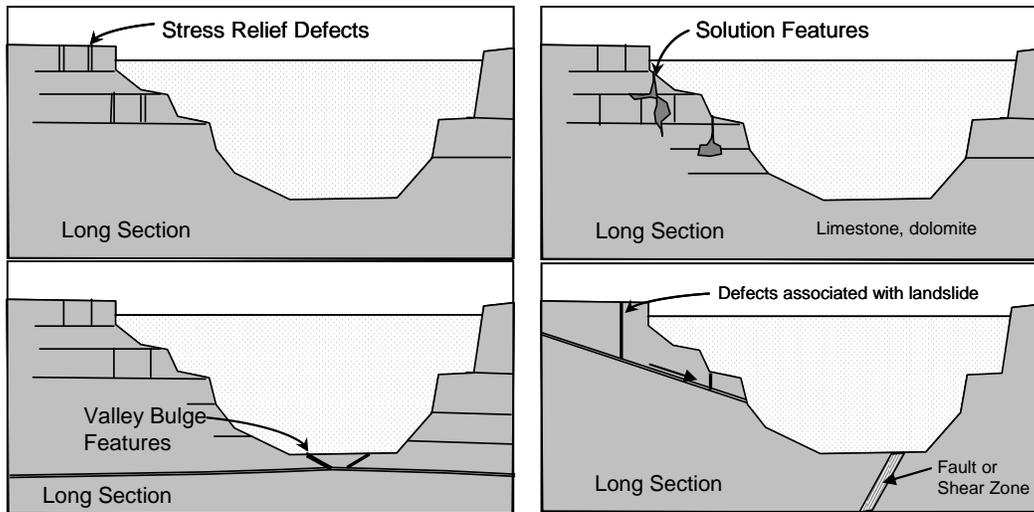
B-16. Defects in Rock Foundations due to Geologic Processes (Fell et al. 2008)
